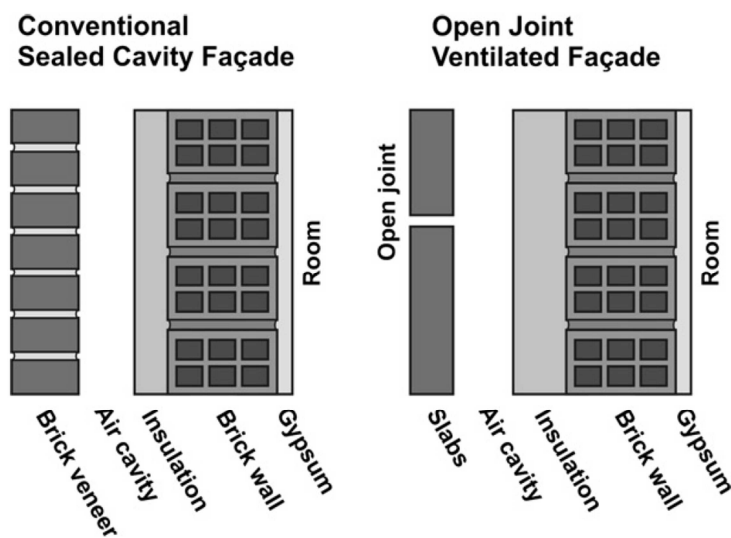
Cross section of a sealed cavity and an open-joint ventilated facade [11].
